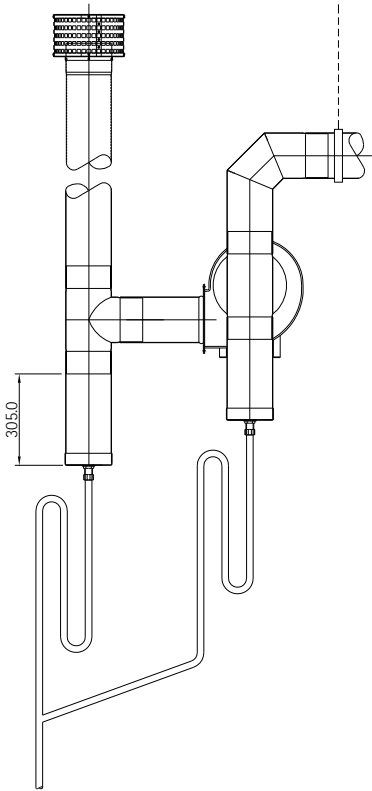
Type 'O' Fan Outlet Dimensions
